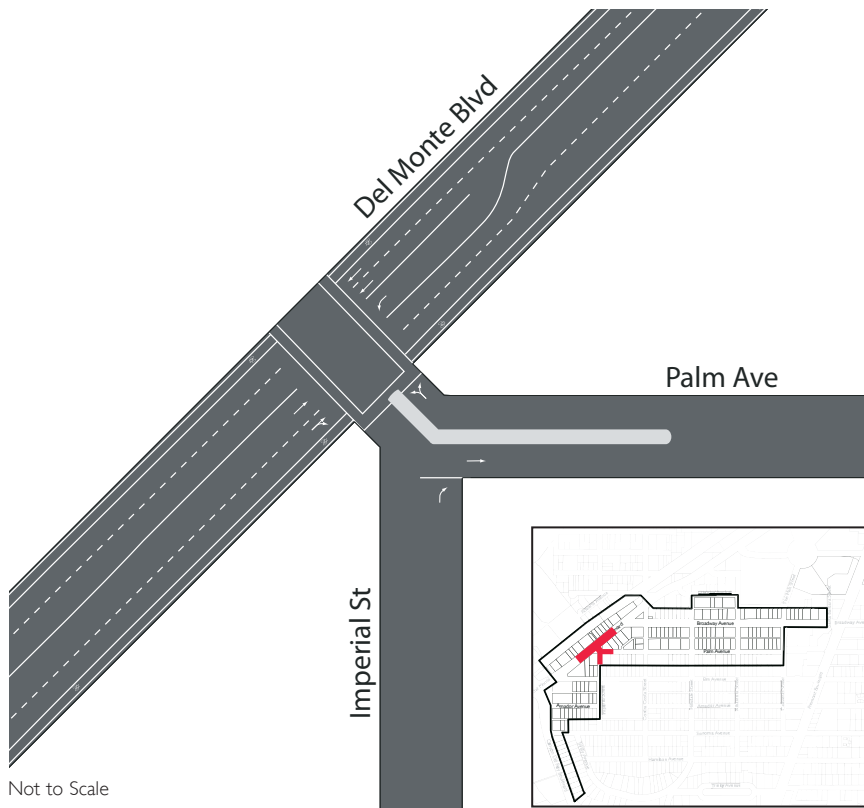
Signalized Intersection of Palm Avenue and Del Monte Boulevard
